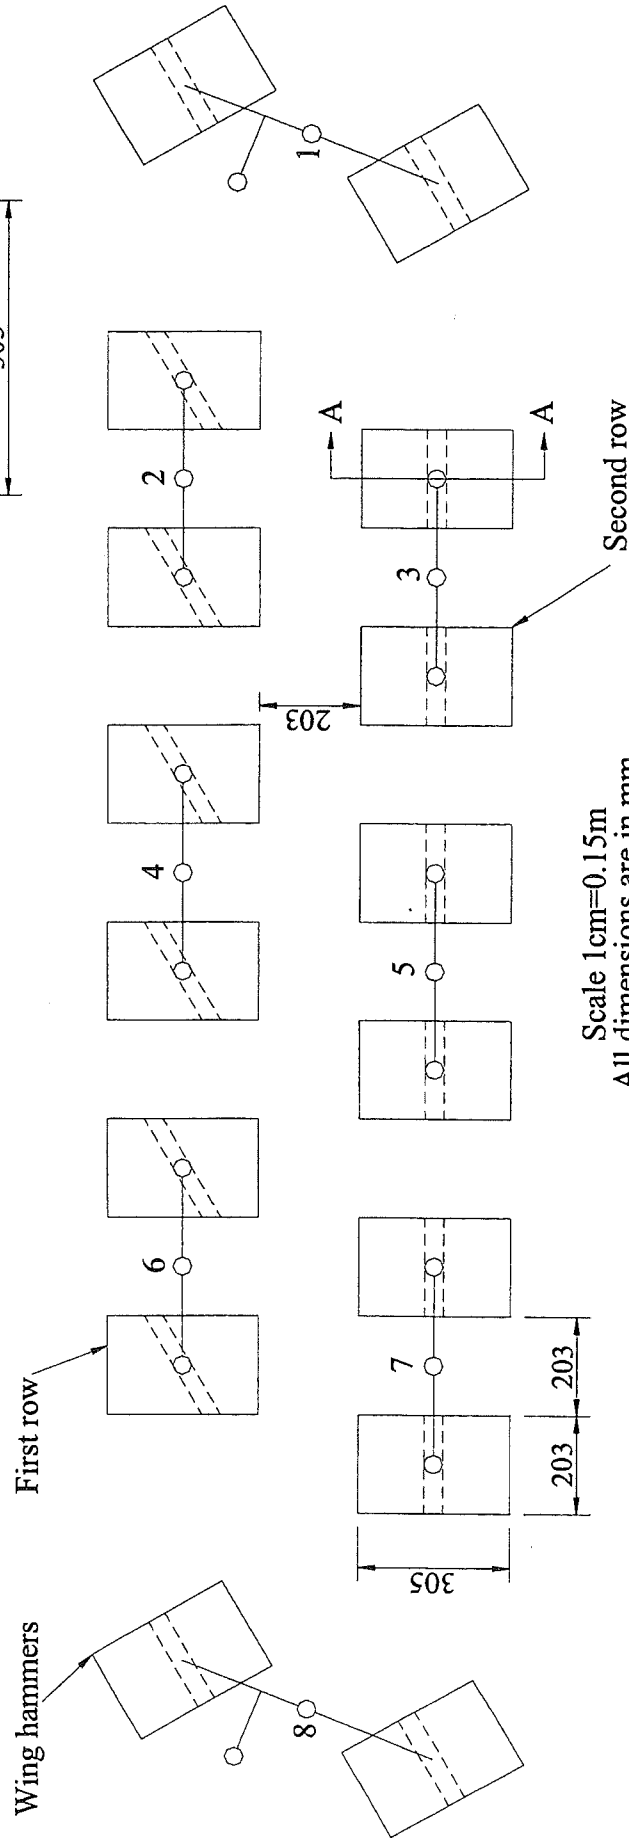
Typical hammer configuration of the multi-headed guillotine breaker (multi-head breaker)
